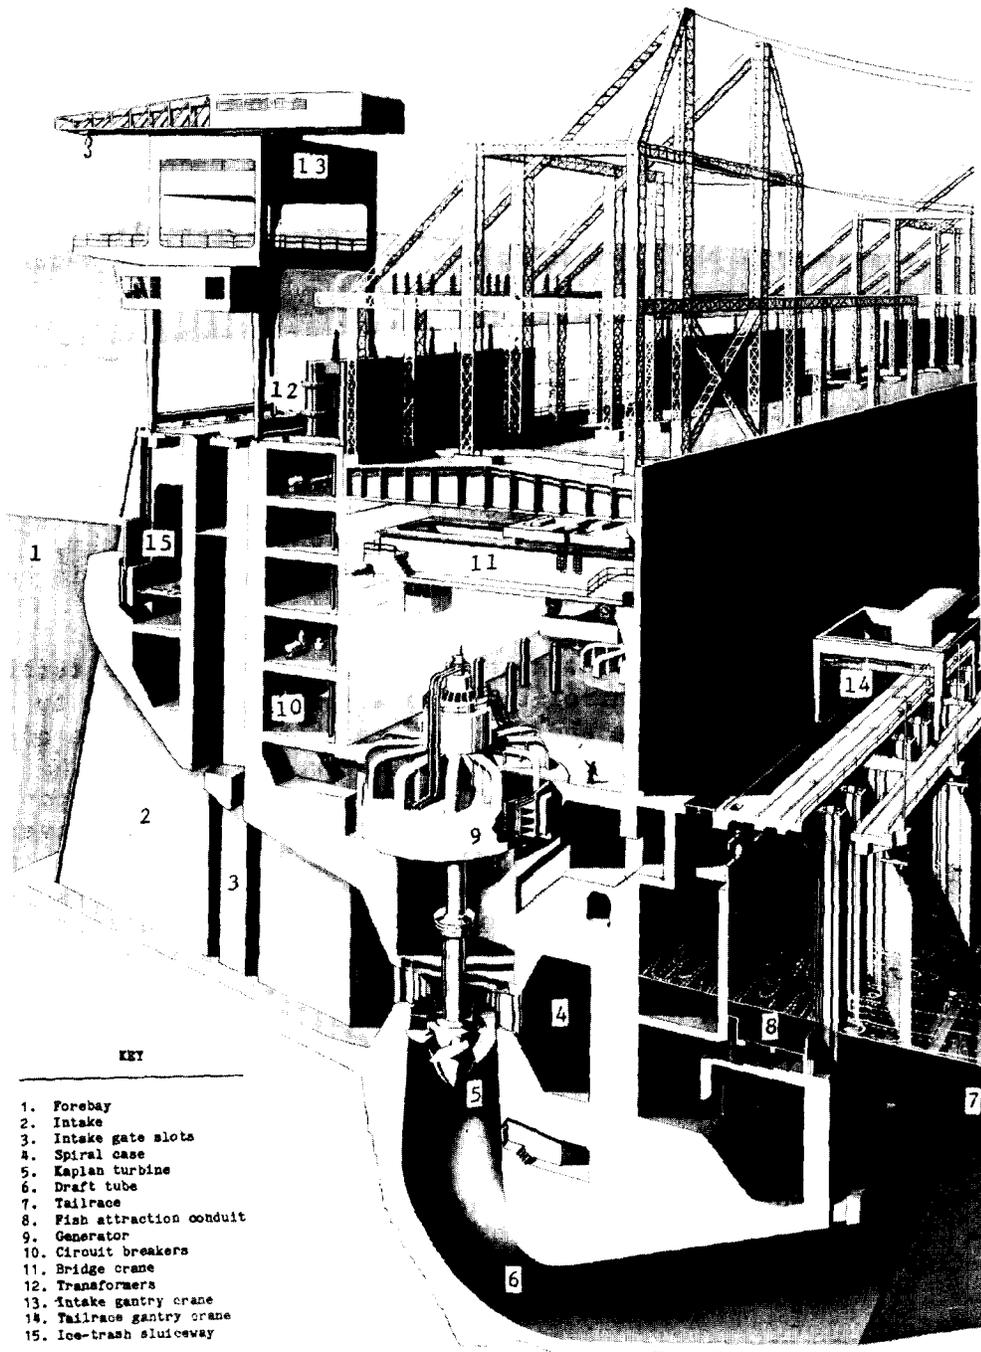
Cross-section of The Dalles powerhouse (Portland District)
